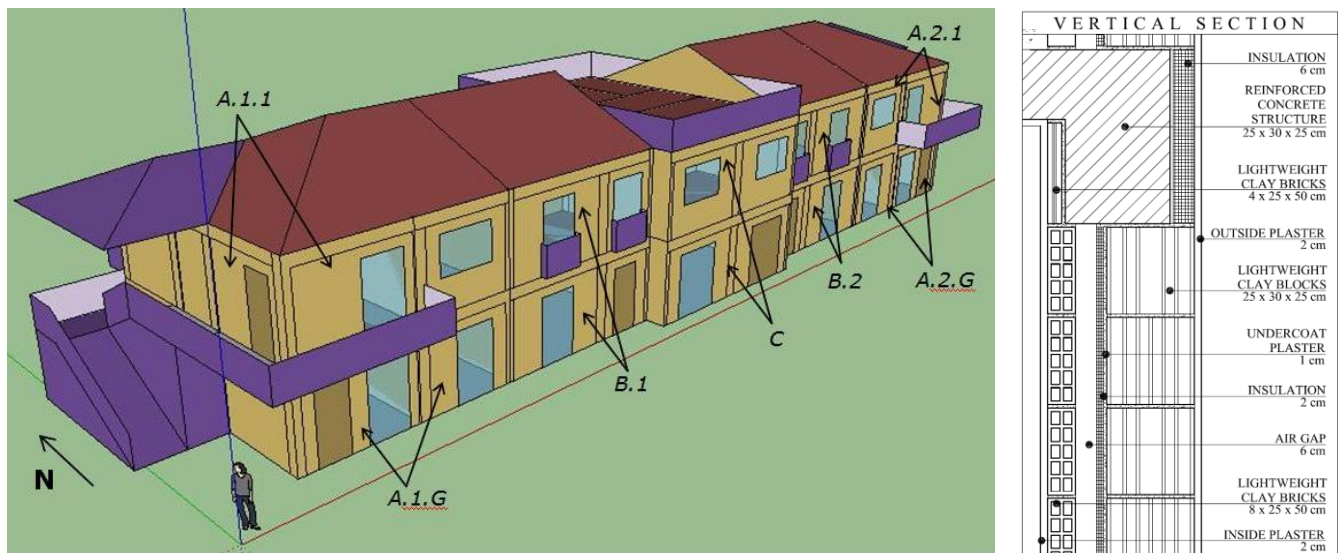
Left: view of the terraced-house apartment building modeled on SketchUp. Right: detail of the external envelope.
